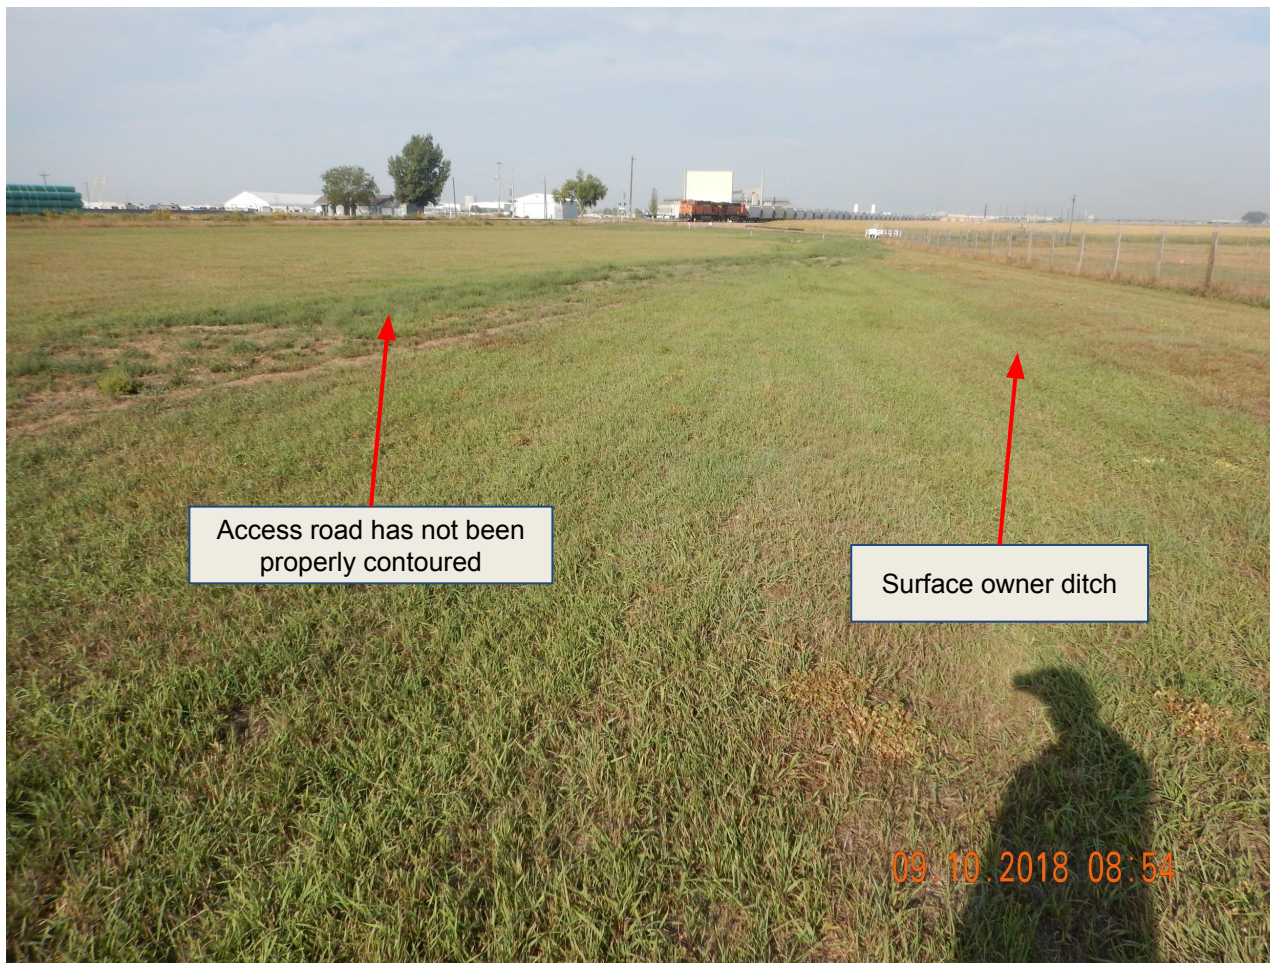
Photo taken along a portion of the access road, facing West. Photo illustrates the access road which has not been properly contoured to along for proper drainage. Access road still remains elevated above the surrounding landscape.
